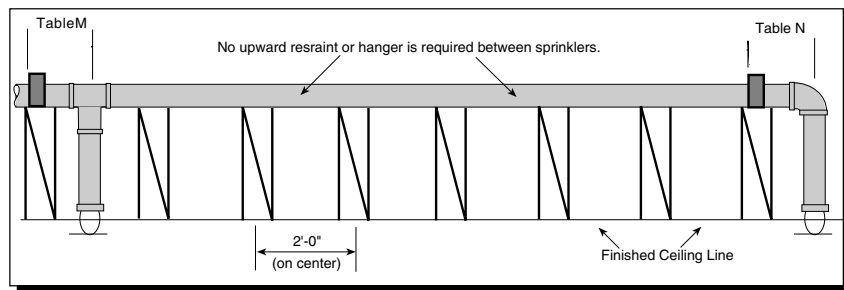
Fig. Q • Sprinkler Drop Pipe Adjacent to Truss
